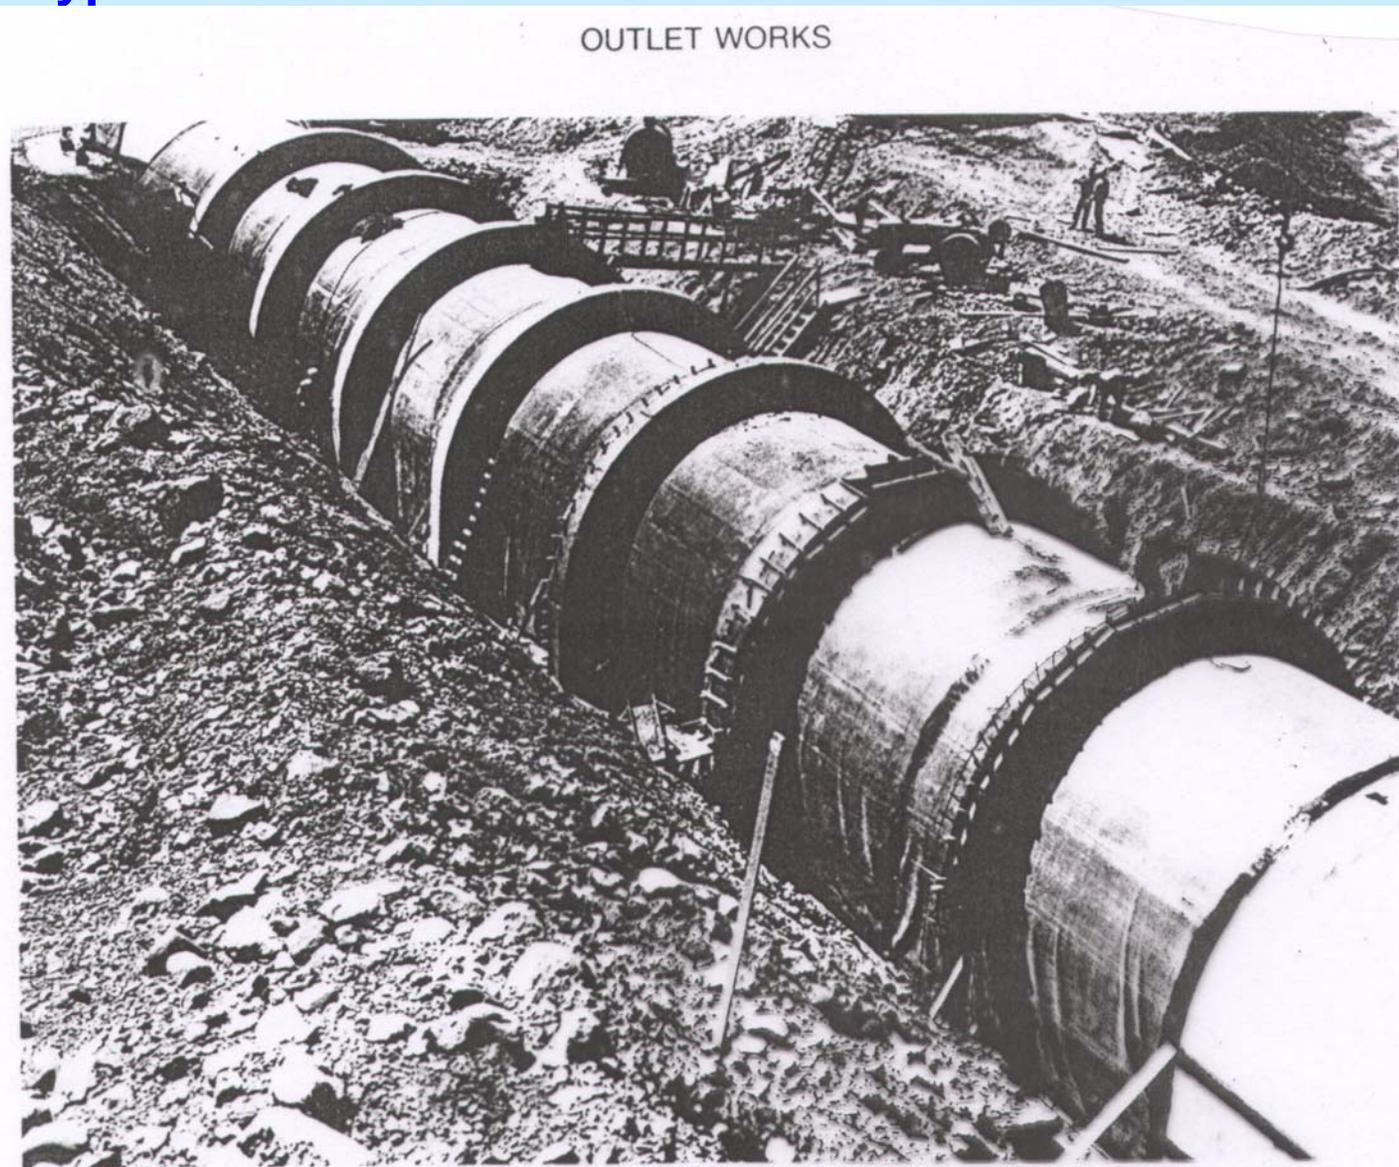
Typical cutoff collars on an outlet works conduit. Silver Jack Dam, Colorado. P860-427-964NA.
